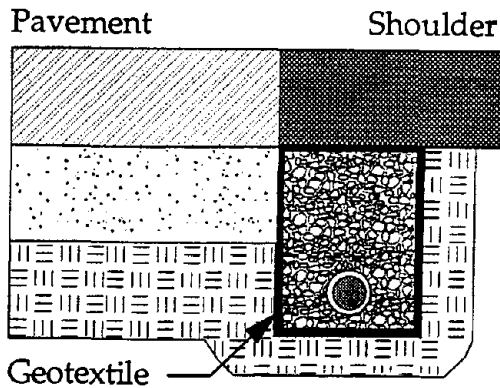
Geotextile wrapped drain.<sup>(67)</sup>
